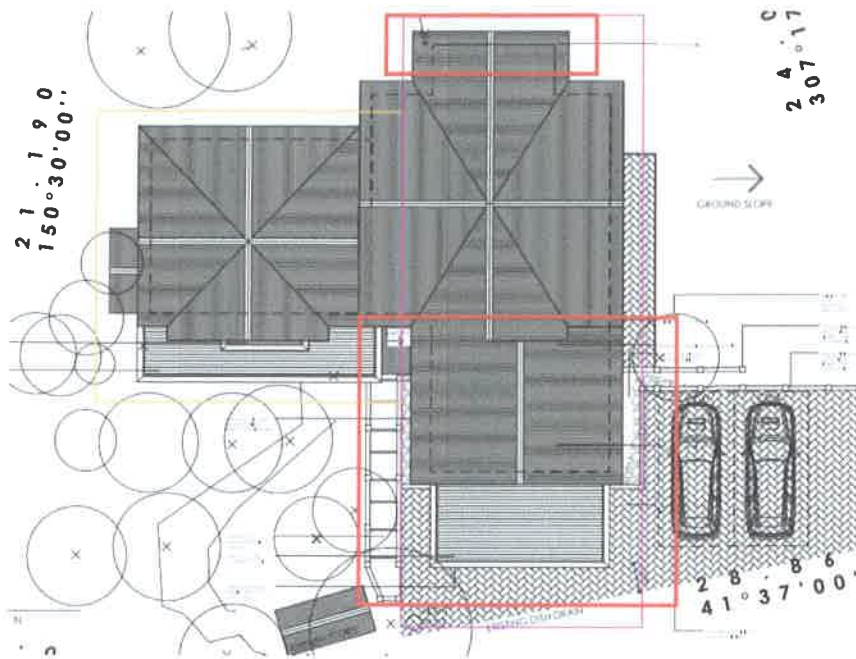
Proposed roof plan of Athol Lodge. The area of the proposed works is outlined in purple and the area of proposed additions are outlined in red.
